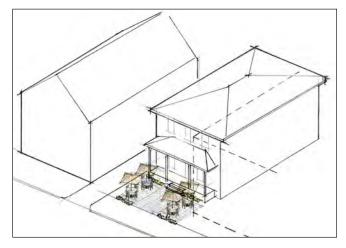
PROPOSED OUTDOOR SEATING IN FRONT OF BUILDINGS WITH A SETBACK.
